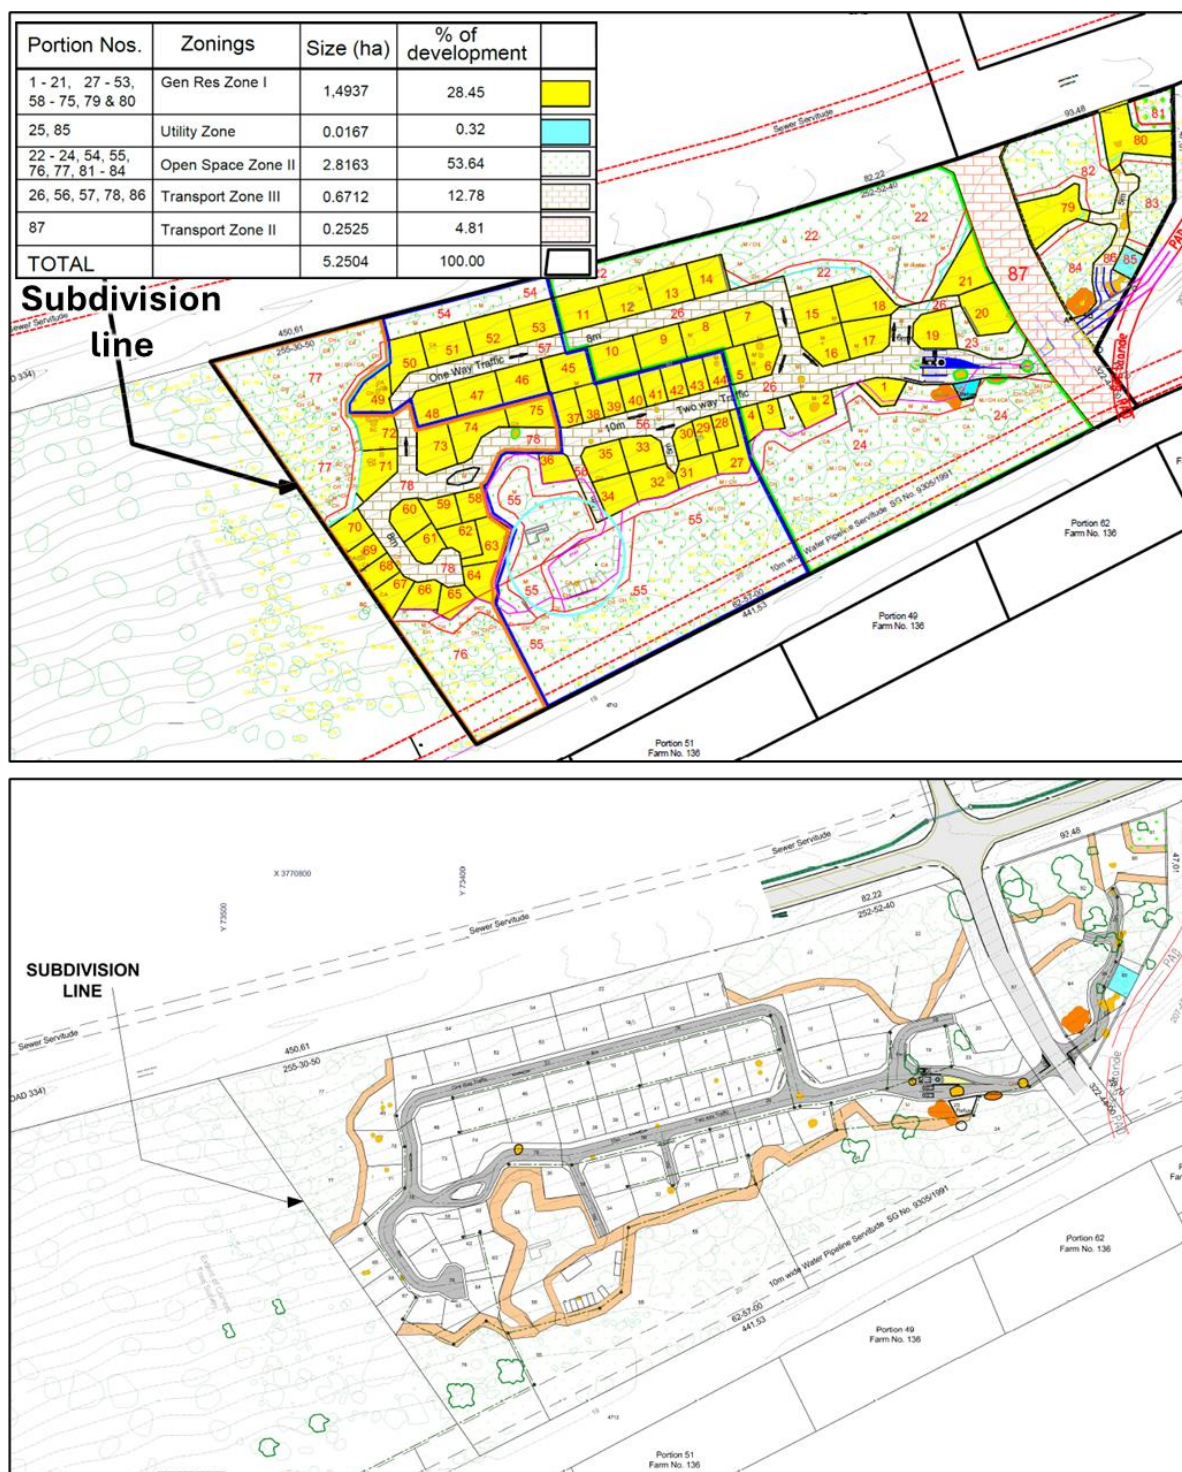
The site development plan of Erf 2841. The top plan indicates the planned layout, while the bottom map is for the proposed sewer lines and connections over the development area.
